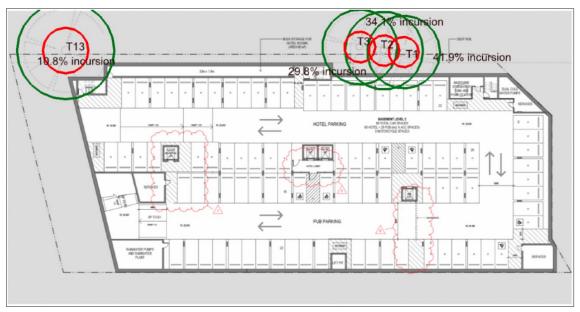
Submitted tree location plan (previous basement level 2 plan)
